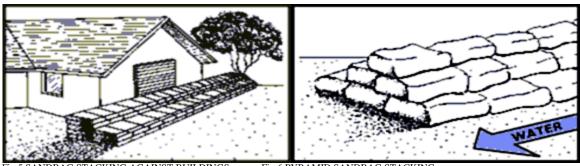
SANDBAG STACKING AGAINST BUILDINGS
